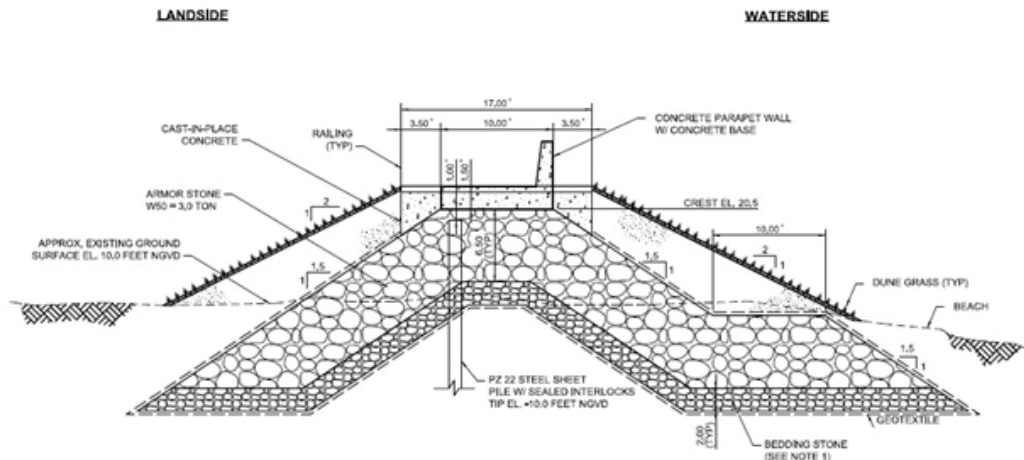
Concrete Parapet Wall atop Buried Seawall
